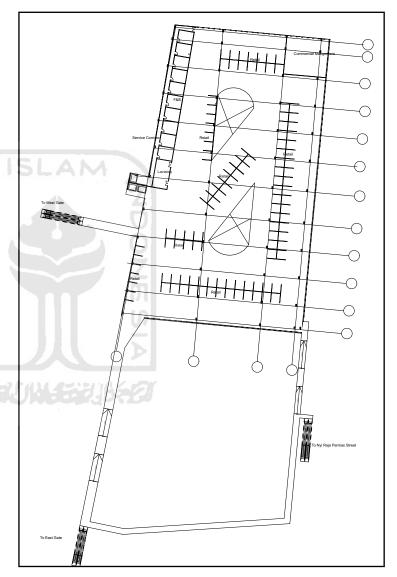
Commercial center floorplan Source: Author (2021)
